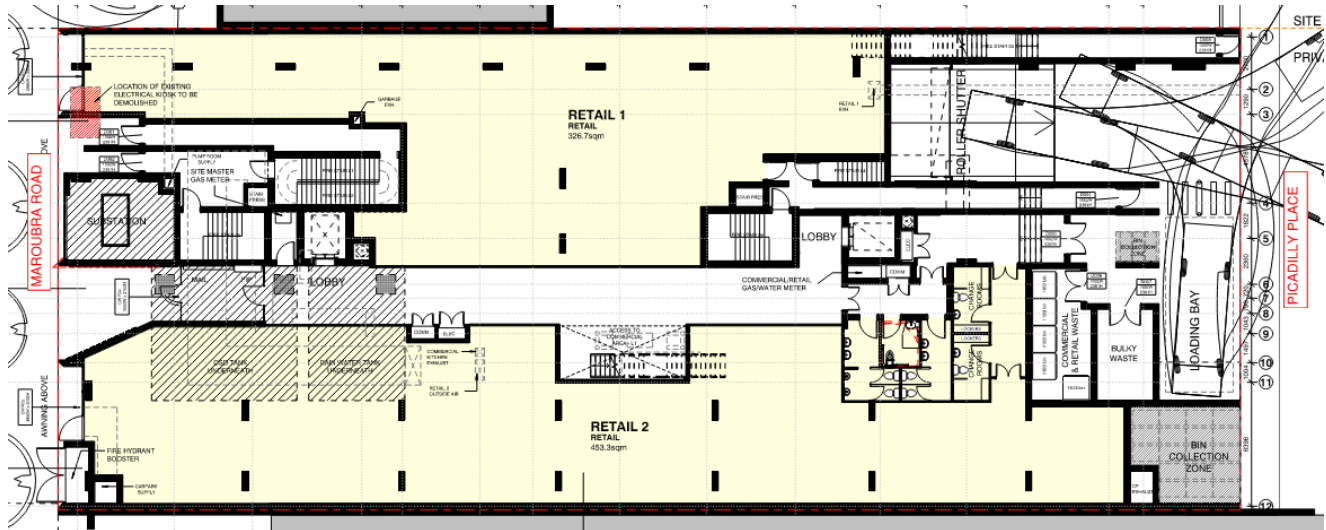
Proposed Ground Floor Plan (Source: Djrd Architects – DA1.104)
